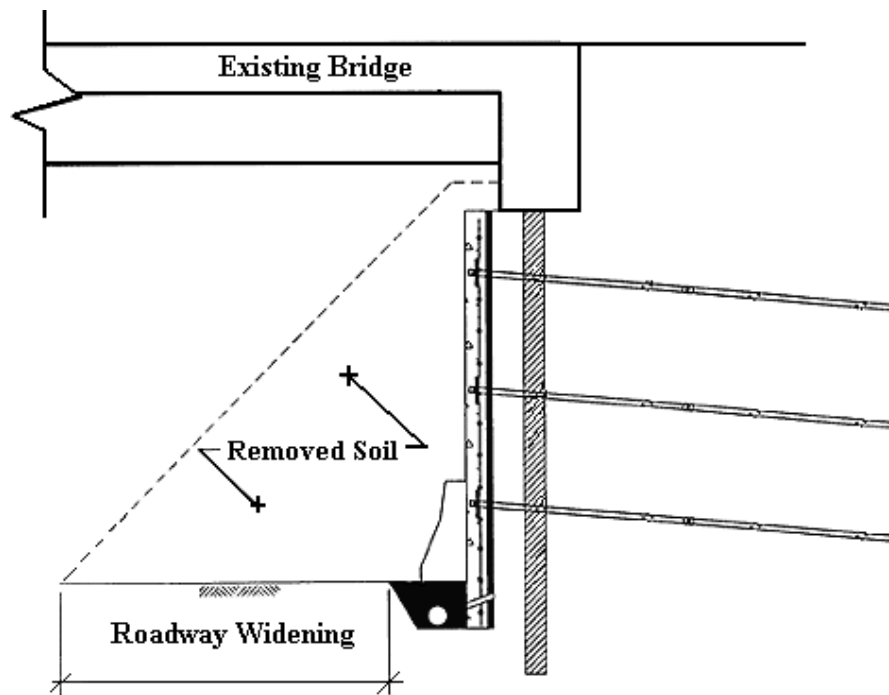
Soil nail wall system used for roadway widening at bridge abutment [20]
